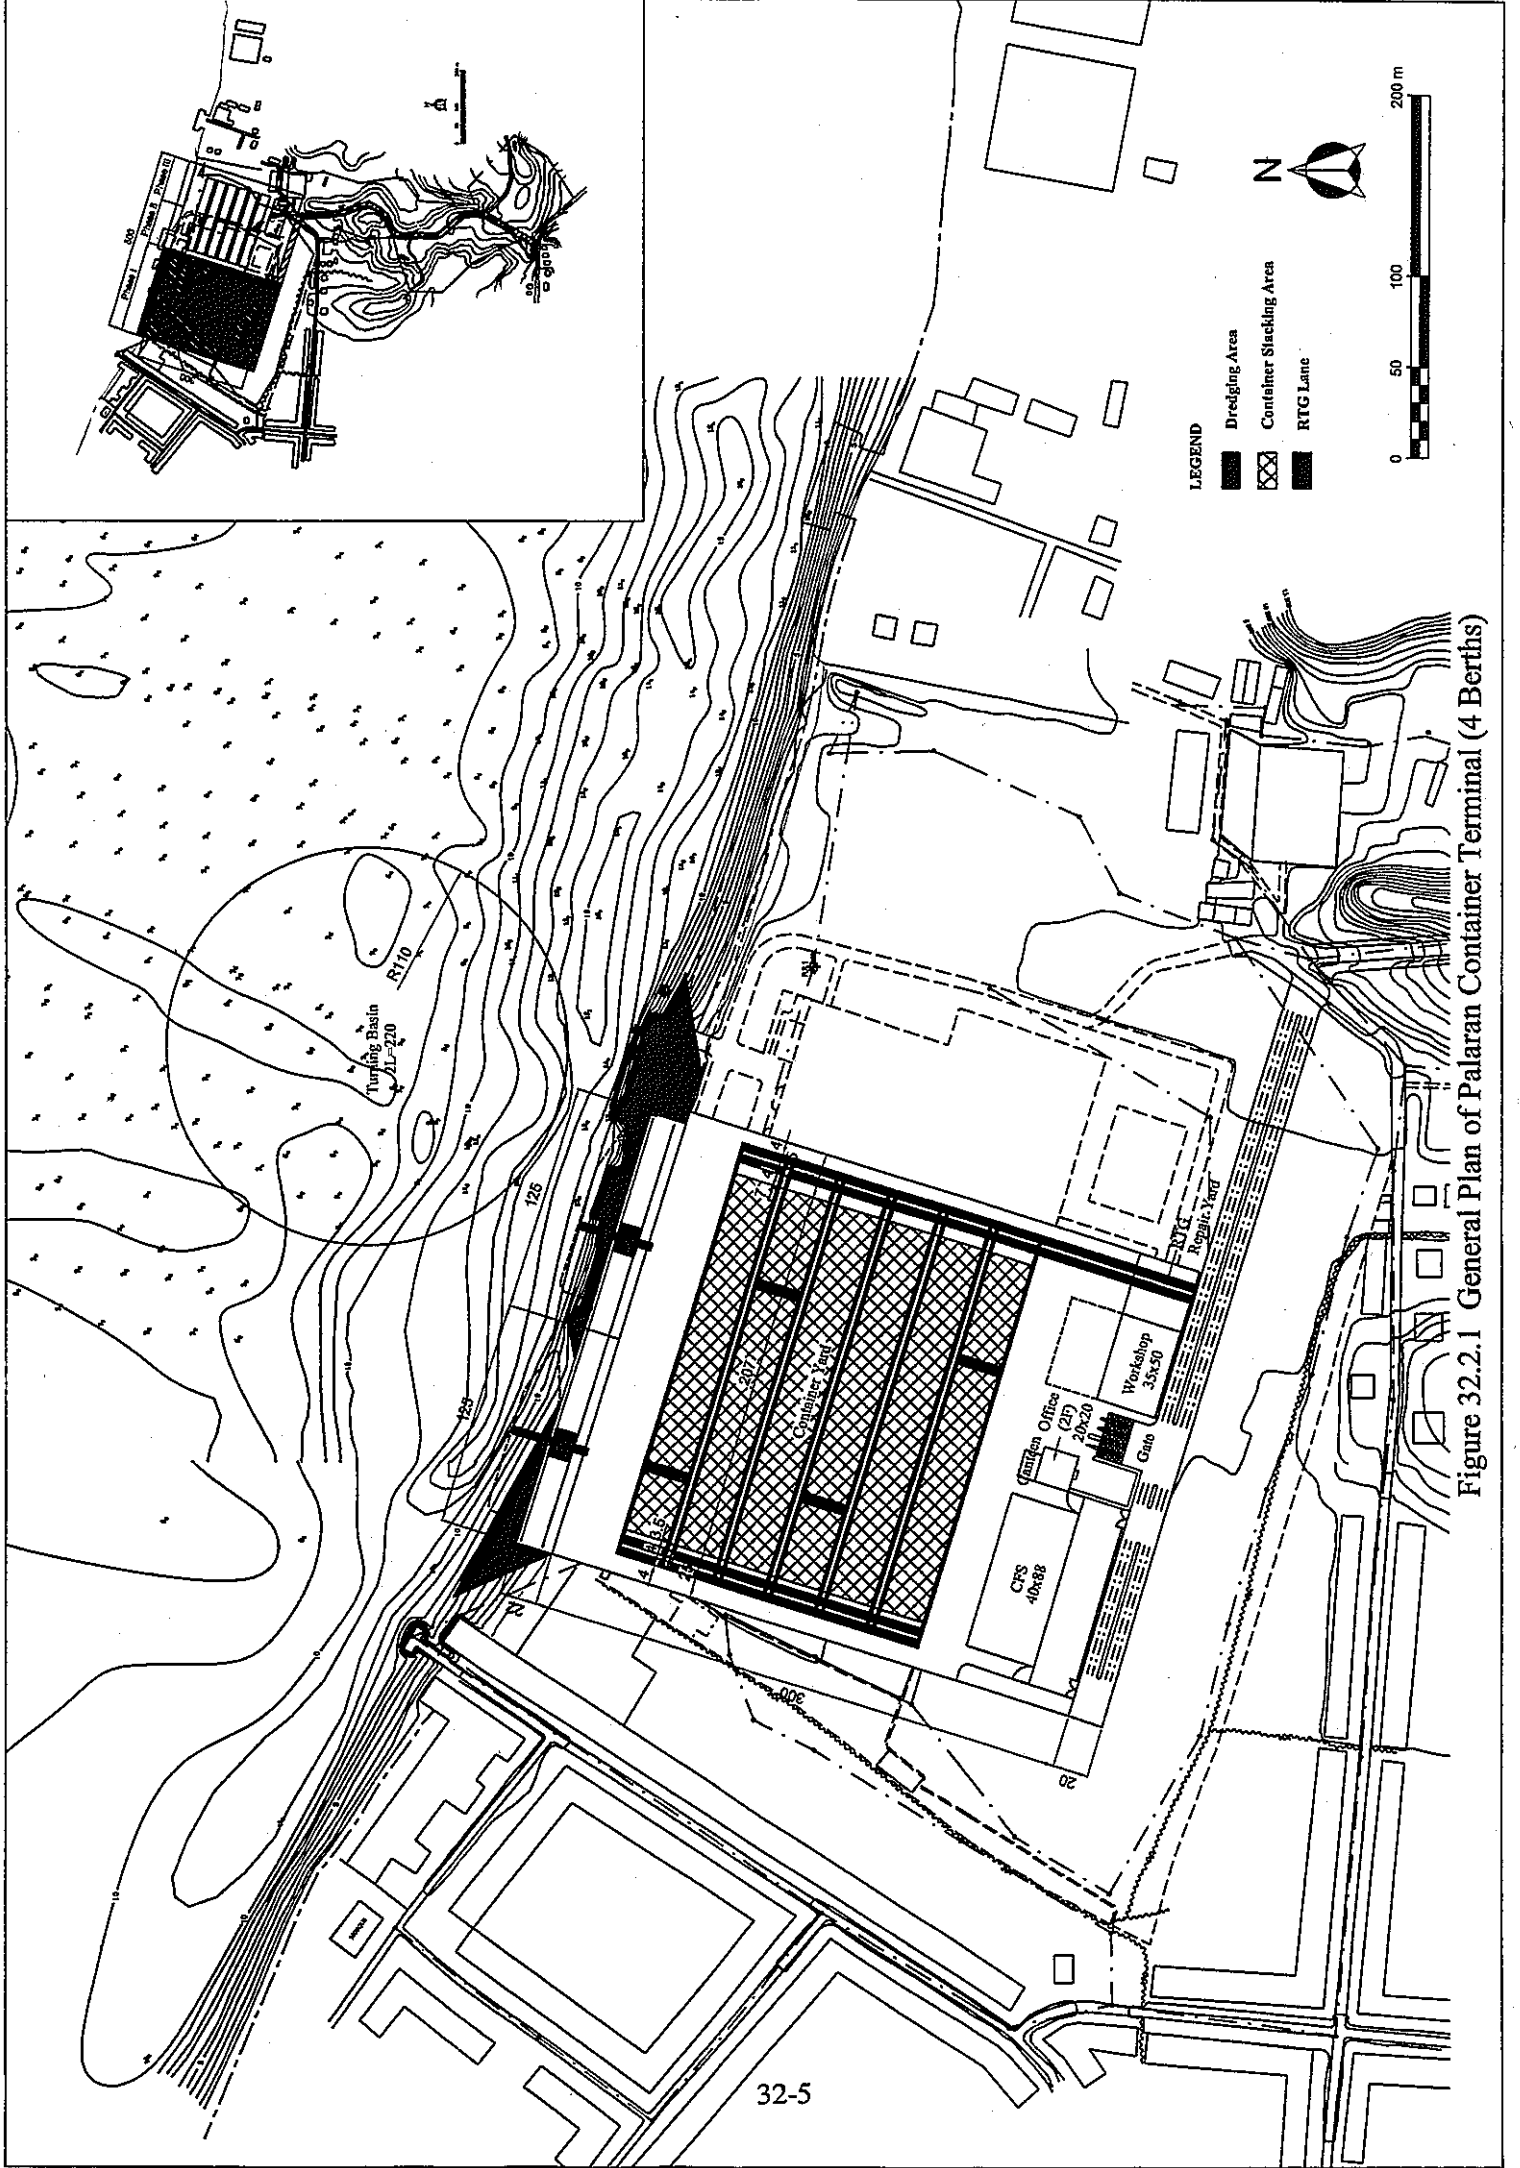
General Plan of Palaran Container Terminal (4 Berths)
